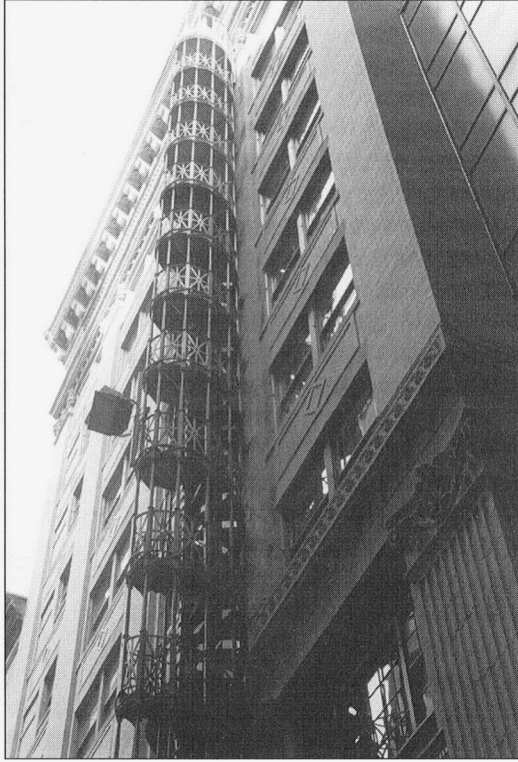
Spiral fire escape on a Boston office building, 31 State Street. (Photo by author.)
